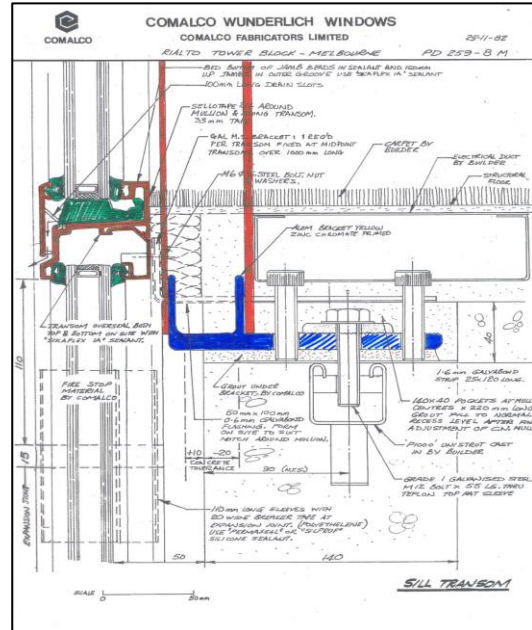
Comalco Fabricators Stick System Curtainwall; Rialto Towers Sill Transom
